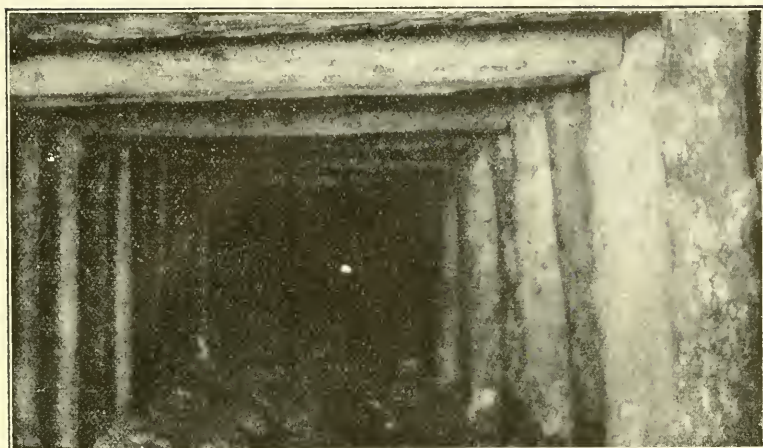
SECTION OF TIMBERING IN TUNNEL.
